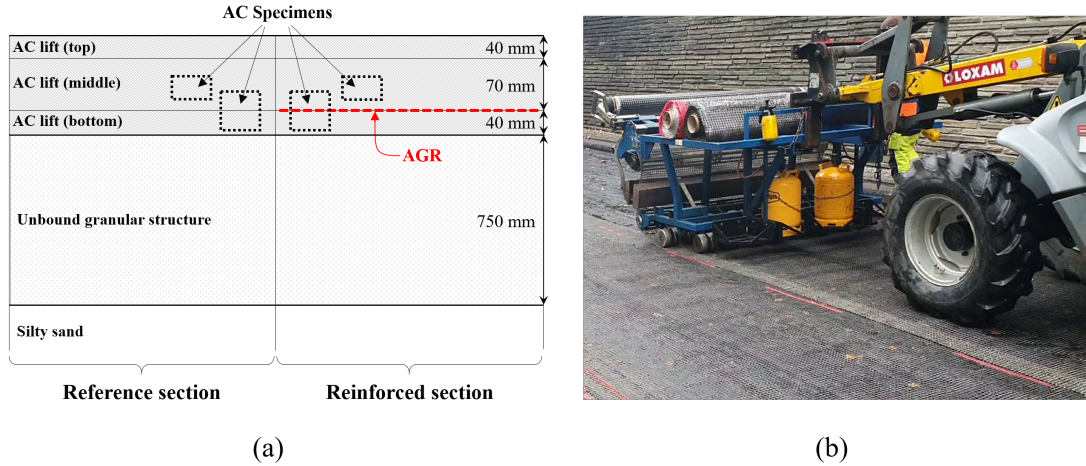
The DTU Smart Road: (a) a cross-sectional view of the two considered pavement sections indicating core locations, and (b) photo of AGR installation.
